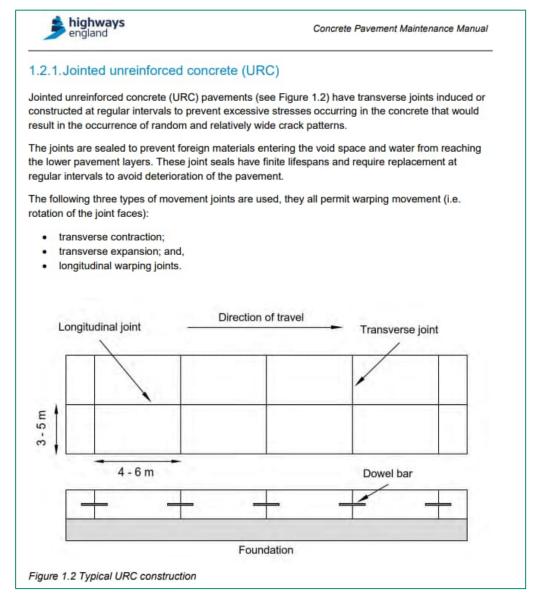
Typical Concrete Pavement (Source: HE - Concrete Pavement Maintenance Manual, June 2021)
